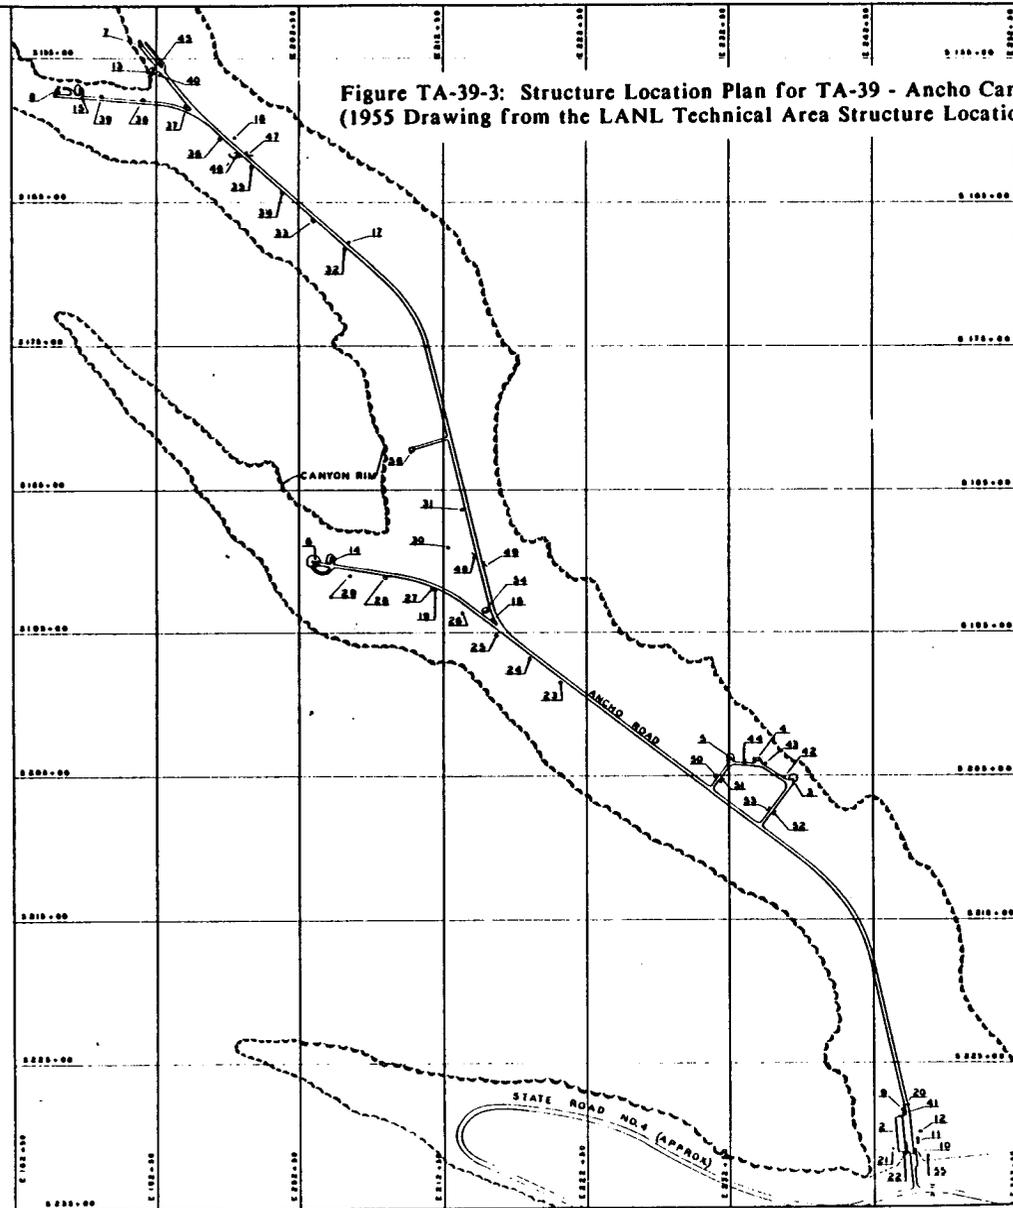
Structure Location Plan for TA-39 - Ancho Canyon Site
